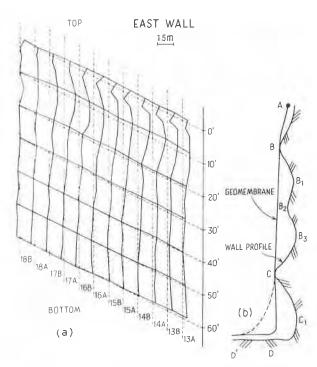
(a) Surveyed shape of the East wall of the cavity after excavation. (b) Assumed shape of of the geomembrane after installation.
